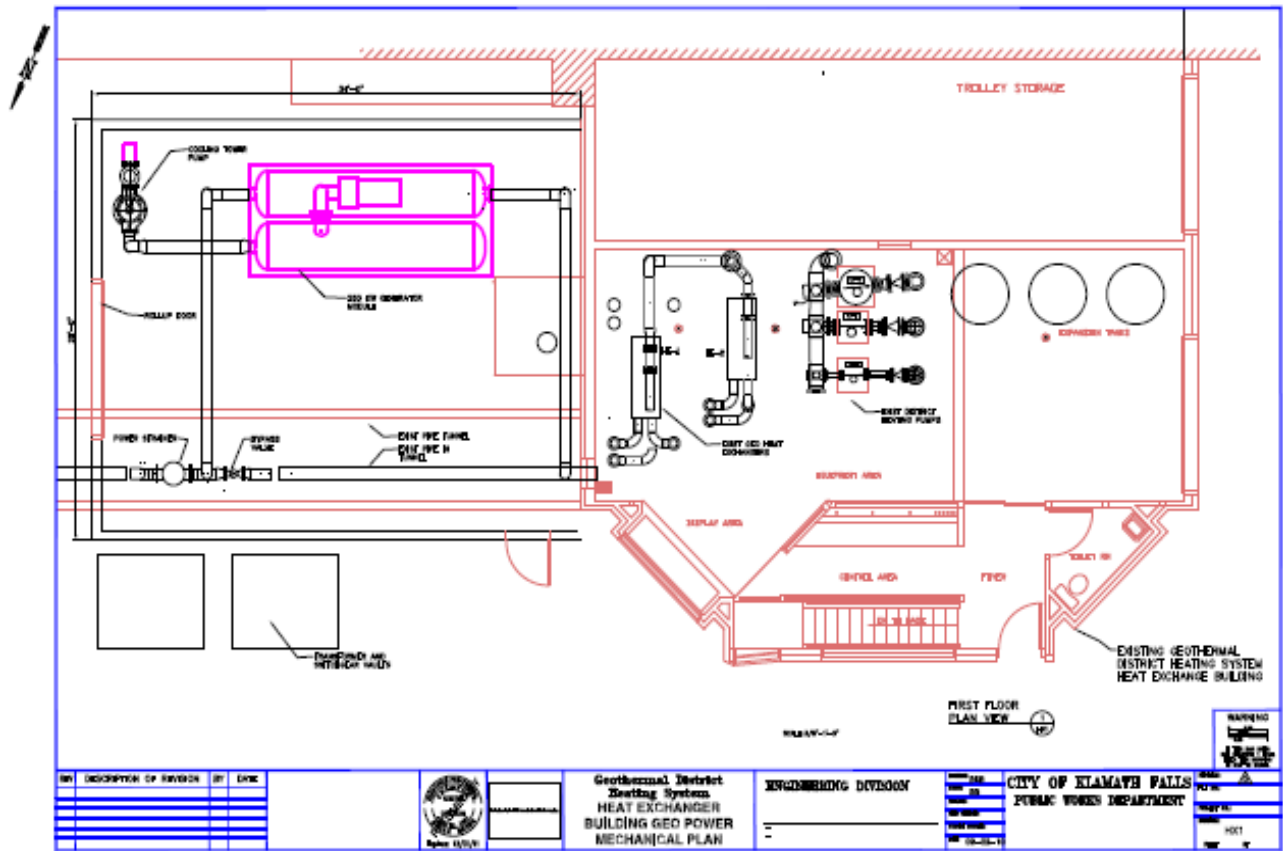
Preliminary site plan for the proposed new geothermal power plant.
